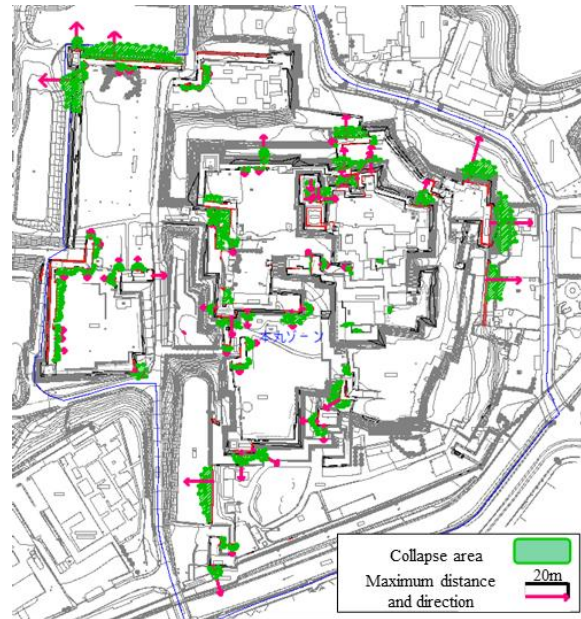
Collapse area and Stone movements of damaged stone walls in the Honmaru area.
